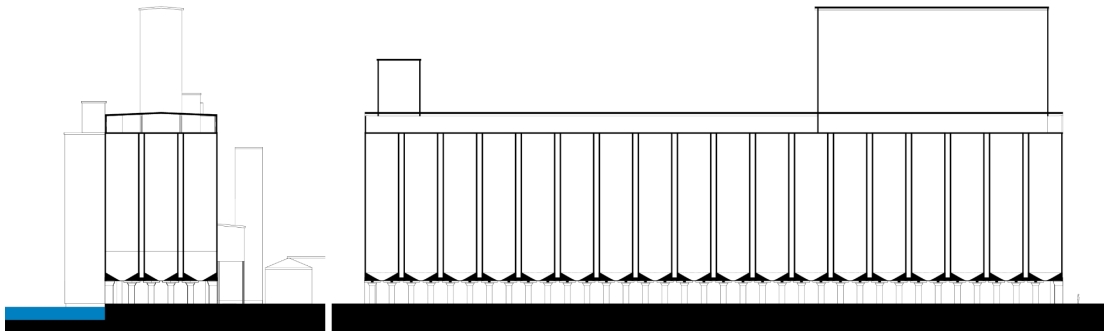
Existing Condition of Red Hook Grain Elevator seen in section. Note that there are no floors in the existing silos. Image Credit: Author
